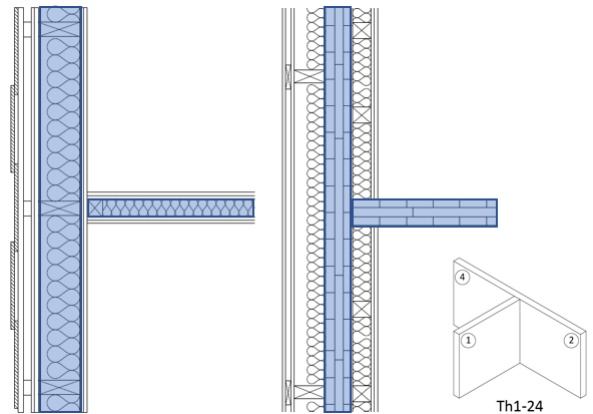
Example of junction types depending on the core layer for an T-junction between two walls with framing stud walls (left) and elements of cross-laminated timber (right)
